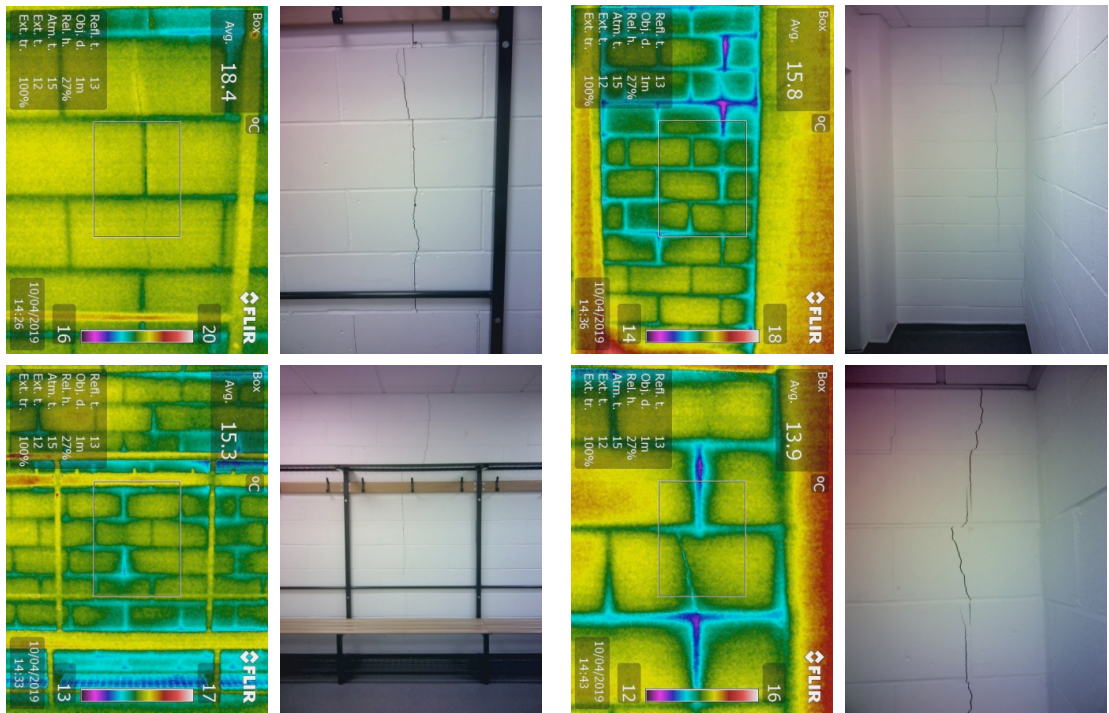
Thermal images and digital images of cracks in the internal wall (changing room 5)
